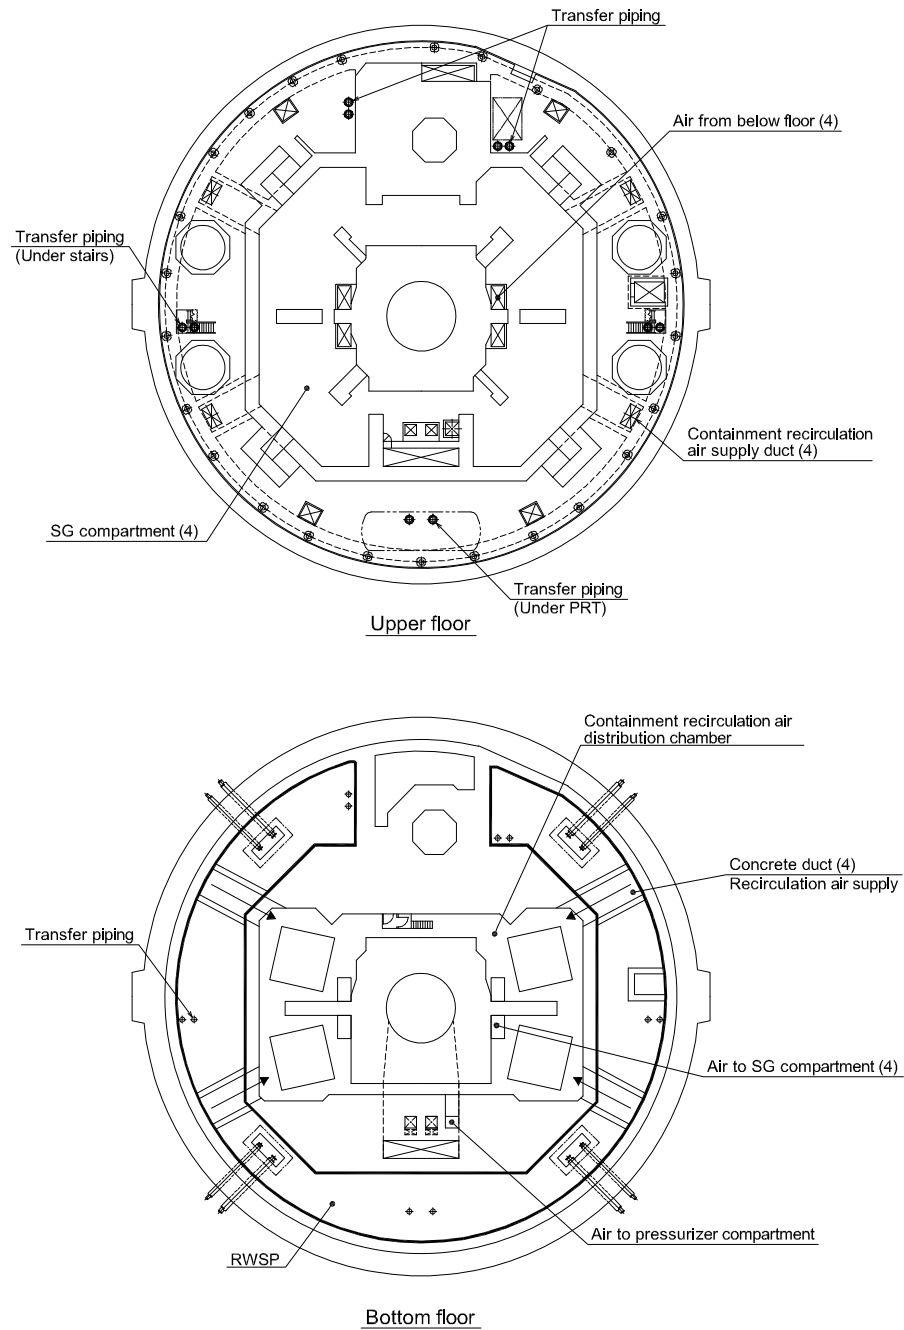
RWSP Upper and Lower Plan View at Elevation 25 ft.- 3 in.
